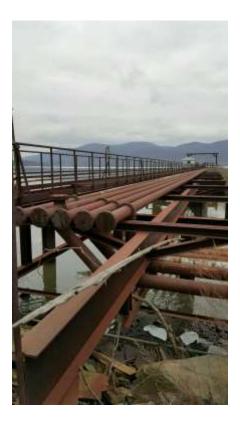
Remaining onsite piping at the location of the former fuel dock.
